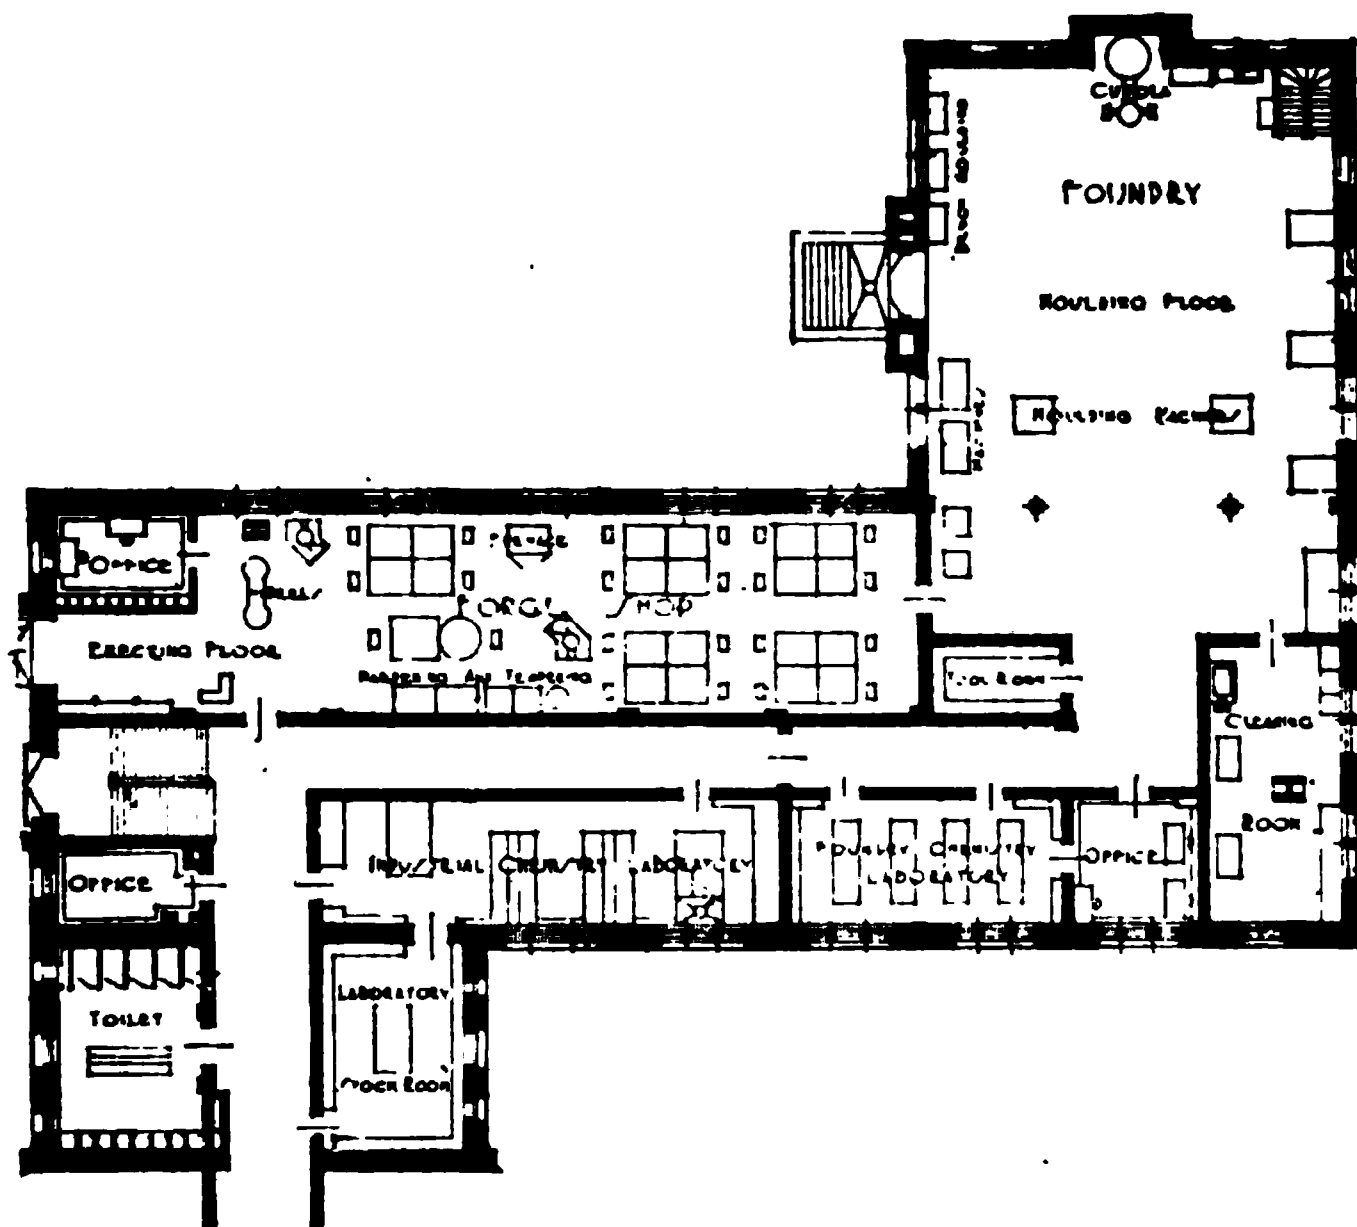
Ground-floor plan of west building, Wentworth Institute.
